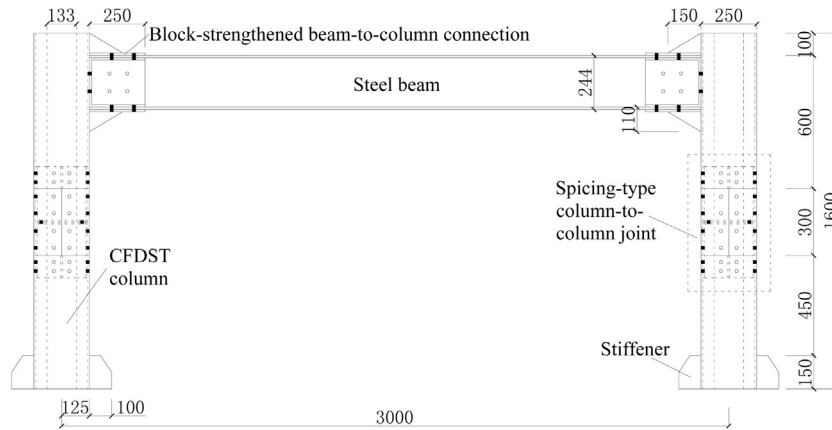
Dimensions of CFDST frame (BF, unit: mm).
